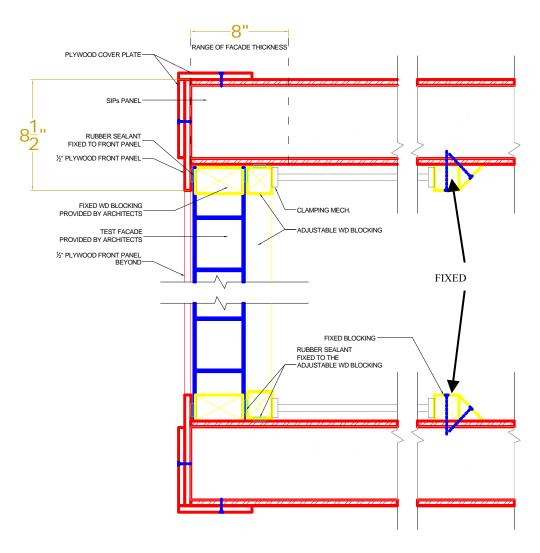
AutoCAD engineering drawing of the modified front façade fixture system [14]
